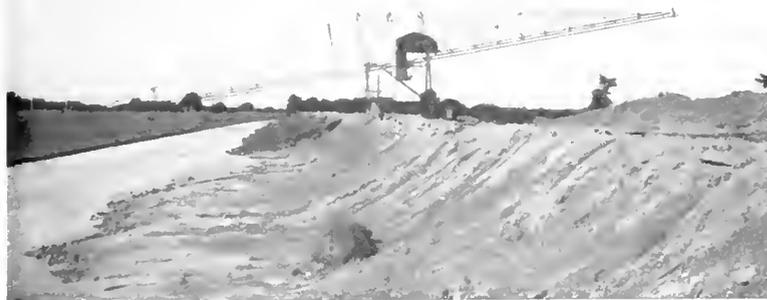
Cantilever Crane Operating Drag Bucket made by Erown Hoisting Machinery Co. 225 H.P., 400 Volt Induction Motor. The United Engineering & Contracting Company, Barge Canal Contract No. 40, Lockport, N. Y.
